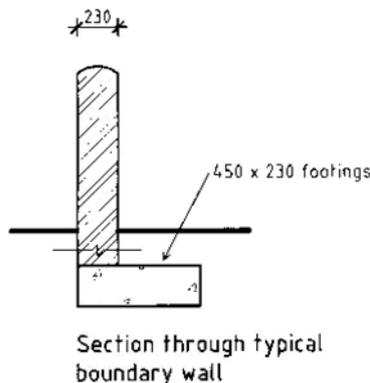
Typical section through a boundary wall. Note foundations on inside of boundary
